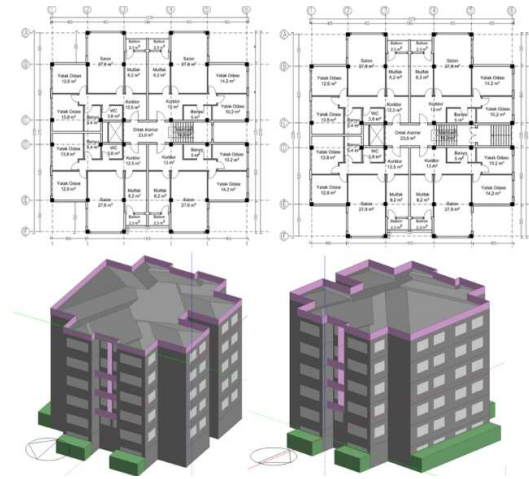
Drawings of floor plans and 3D views of 5-story reference building apartment.
